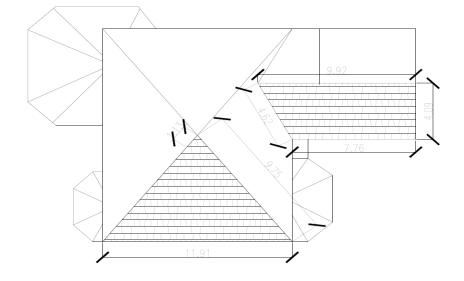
Roof area of the dwelling unit which was estimated for installation of asphalt shingles
